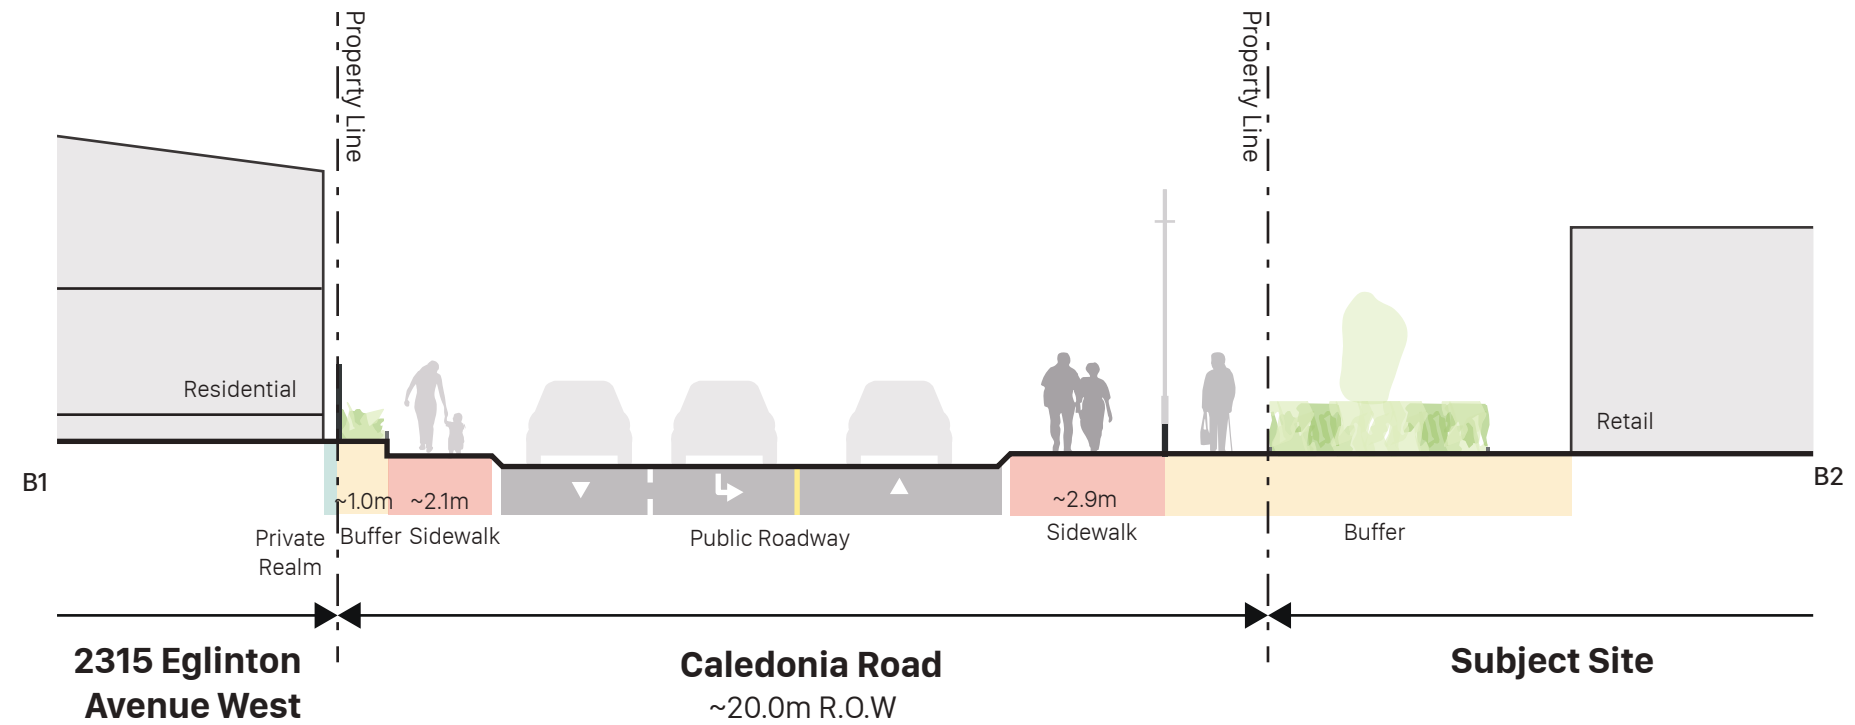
Section B1-B2 Caledonia Road (Existing)
